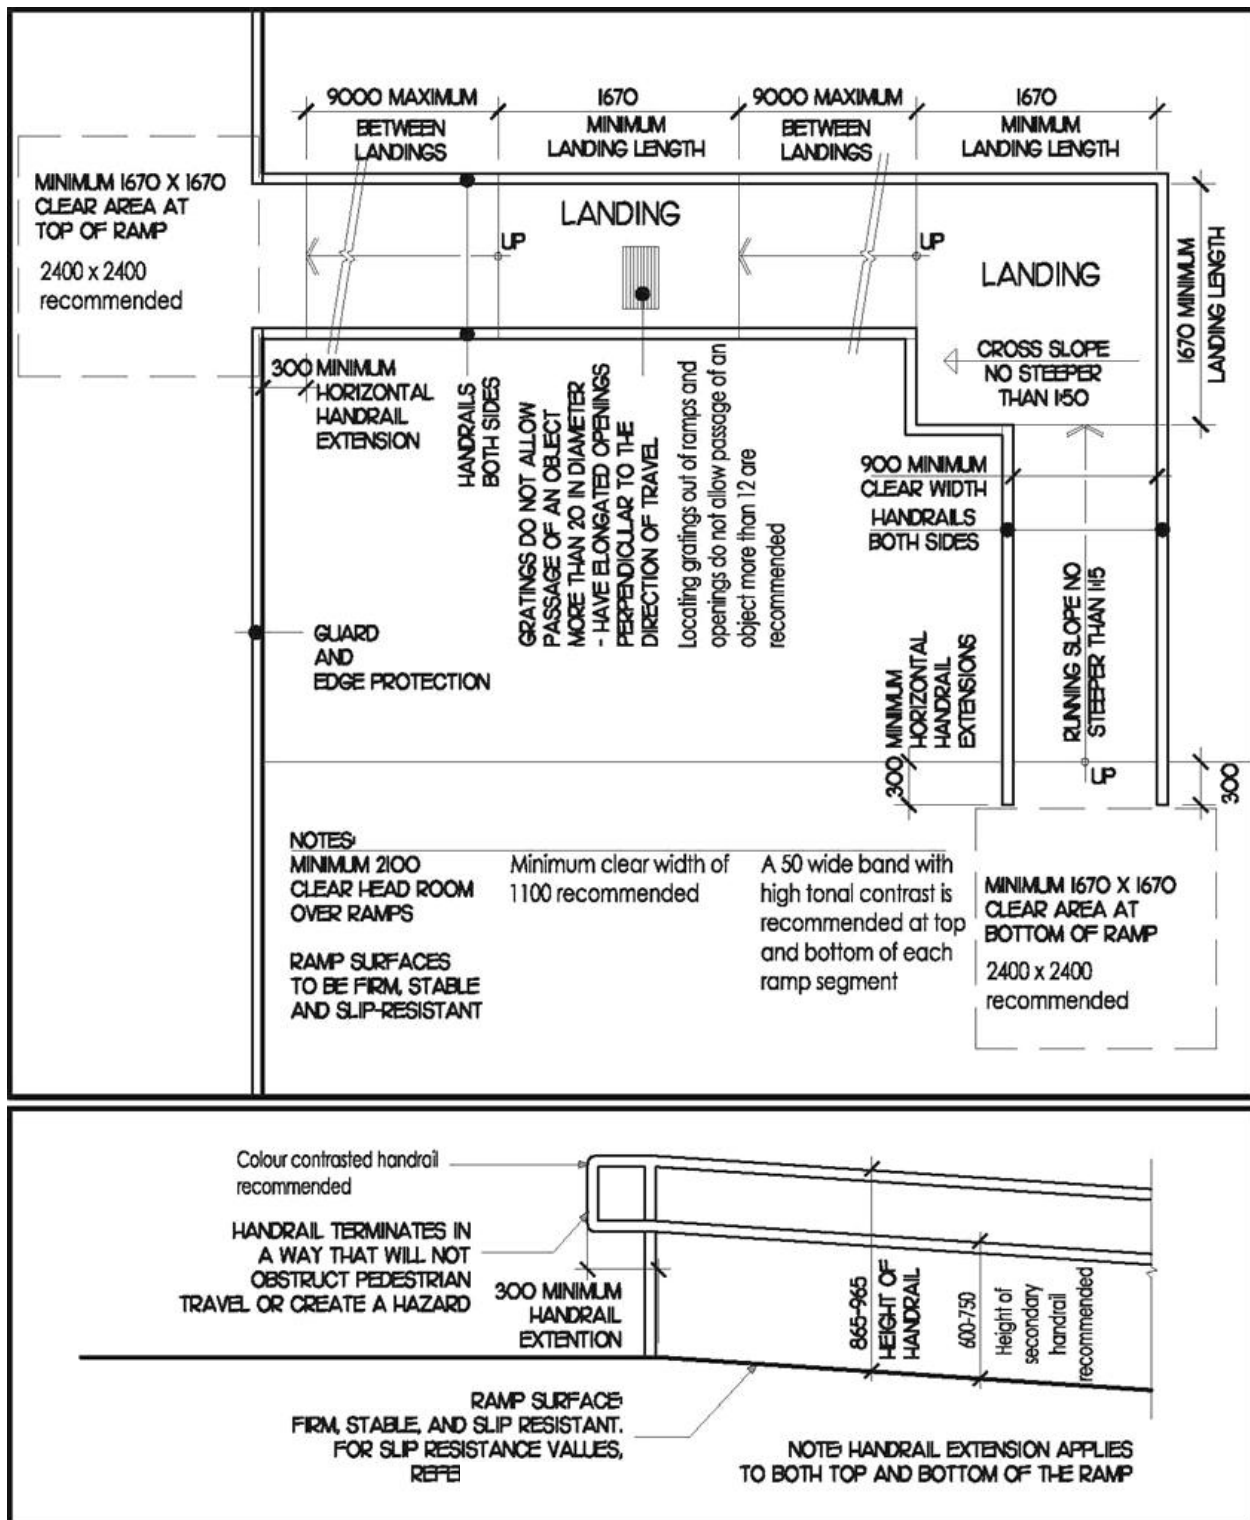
Ramp Criteria- Ramp, Landing and Handrail (Global Alliance on Accessible Technologies and Environments, 2014)
